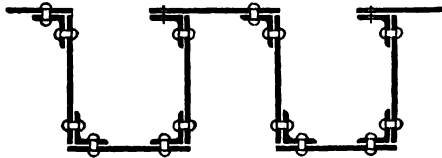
Trough Floor Construction for Easy Field Riveting.
